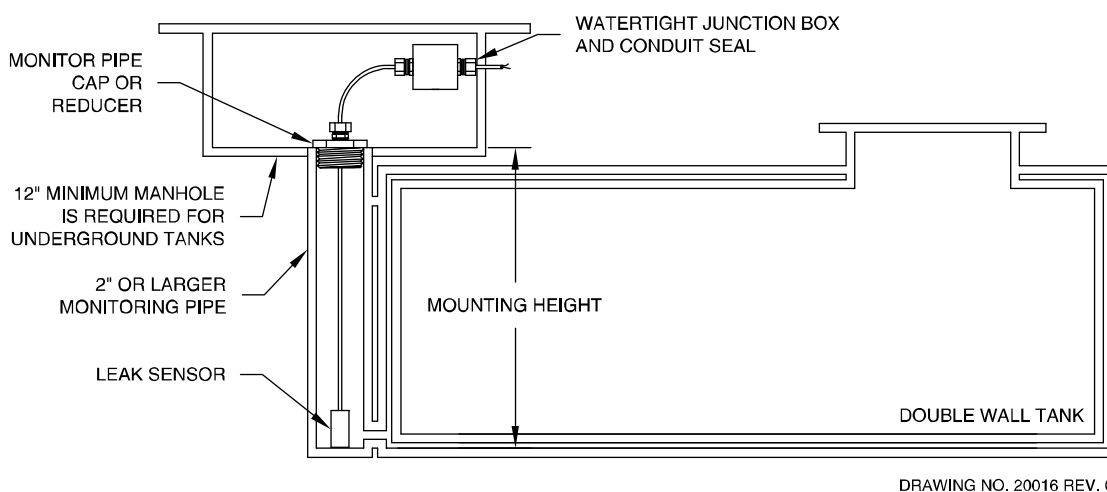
Leak Sensor Installation - Steel Vaulted Tanks
